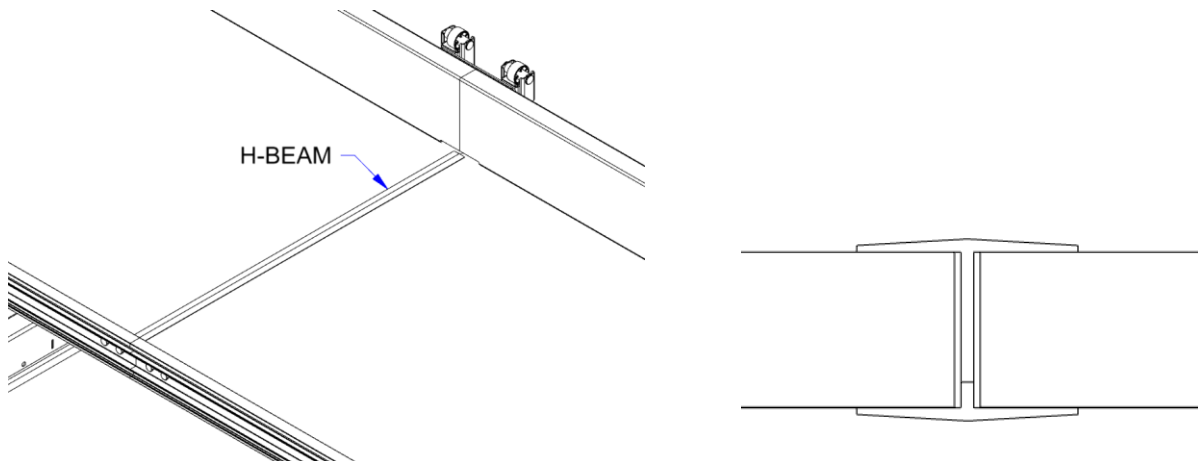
Panelam Decking Splice H-Beam (Decks Assembled)
